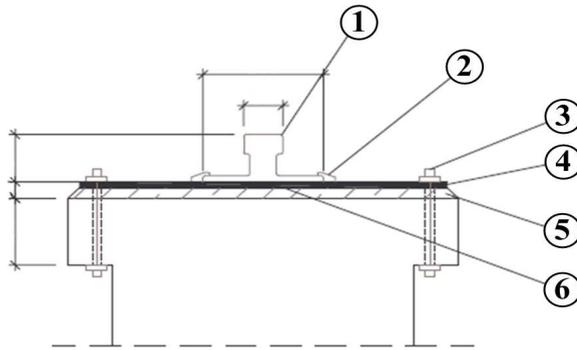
Scheme (cross-section) of elastic connection between rail and runway beam; 1 – crane rail, 2 – fixing clamp, 3 – anchor bolts, 4 – membered plate, 5 – cement screed, 6 – elastomeric washer (dimension in mm)
